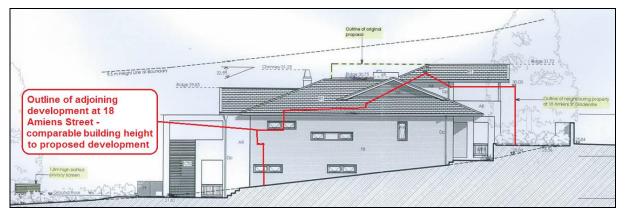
Diagram showing the proposed development and the outline of adjoining development to the east of the subject site at 18 Amiens Street, Gladesville. It is noted that the building height of the proposed development is considered to be comparable when utilizing the definitions for building height as contained within the Ryde LEP 2010 and Ryde DCP 2010 which is measured above existing ground level.
